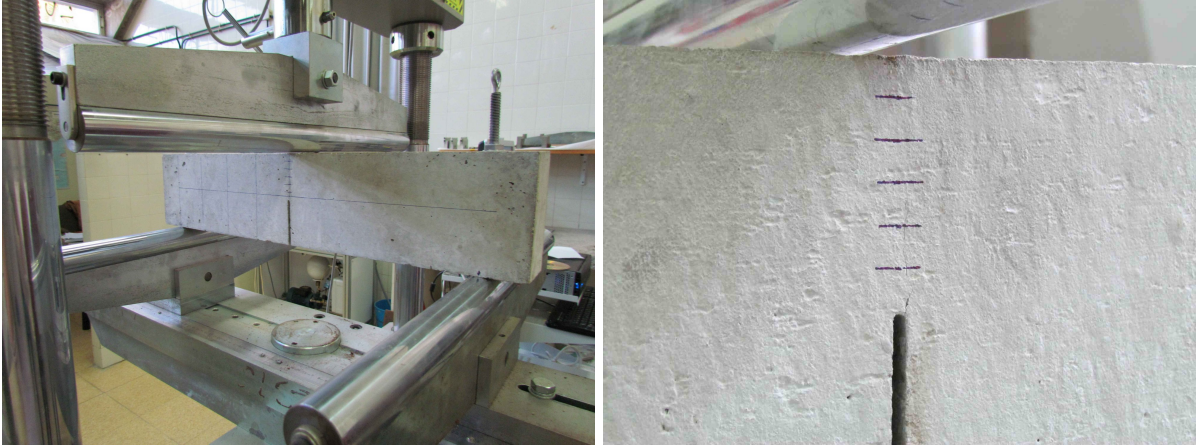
Specimen during a three-point flexural test (left) and detail of cracks after test (right).
